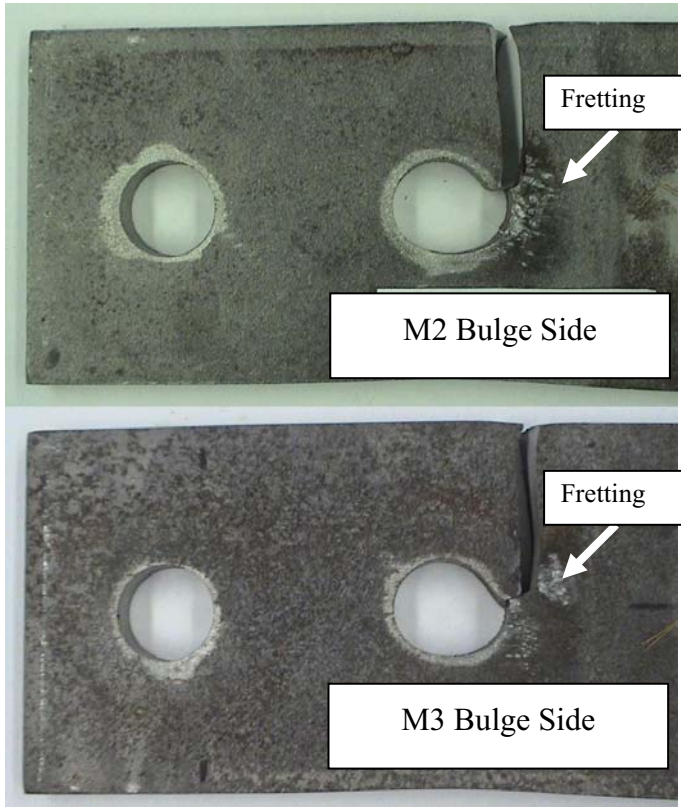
and 8 show the fracture of the base plate on the bulge and nut sides after the dismantling of M2 and M3. The fracture of the base plate progressed from the end of the bolt-hole. Fretting was observed on the surface due to cyclic loading. Fatigue-induced cracks that occurred on the surface around the bolt-hole subjected to fretting may have caused the base plate to fracture.
